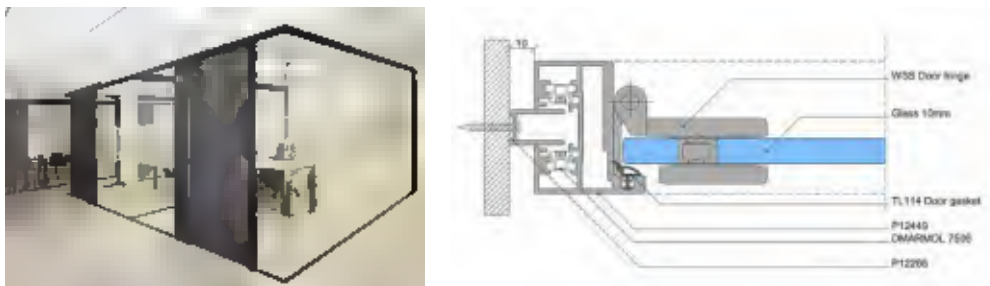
; Demountable Walls: Source (Partition Systems, n.d.)
